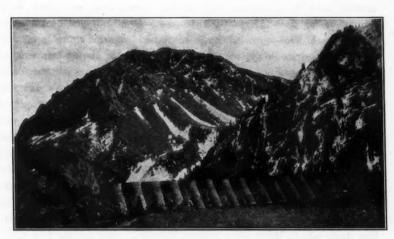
GEM LAKE DAM. WATER LEVEL 35 Ft. ABOVE TUNNEL FLOOR.
